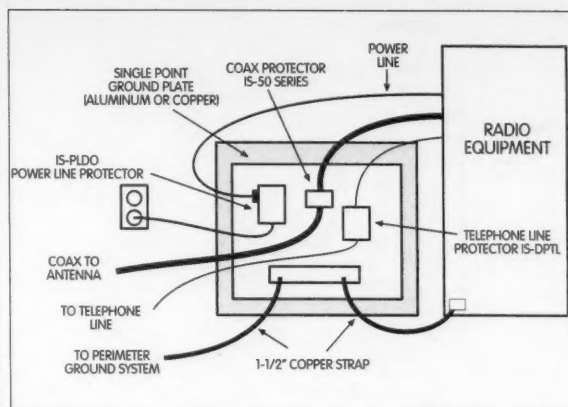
Typical single point ground installation for rack-mounted equipment.
